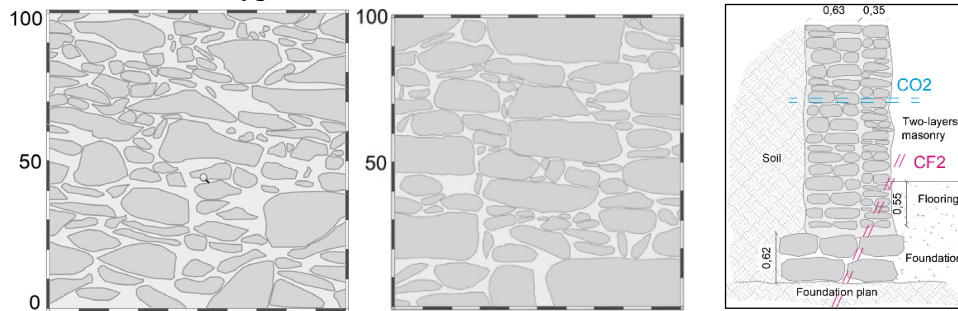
Masonry wall facing and section of the Masegra Castle masonries
